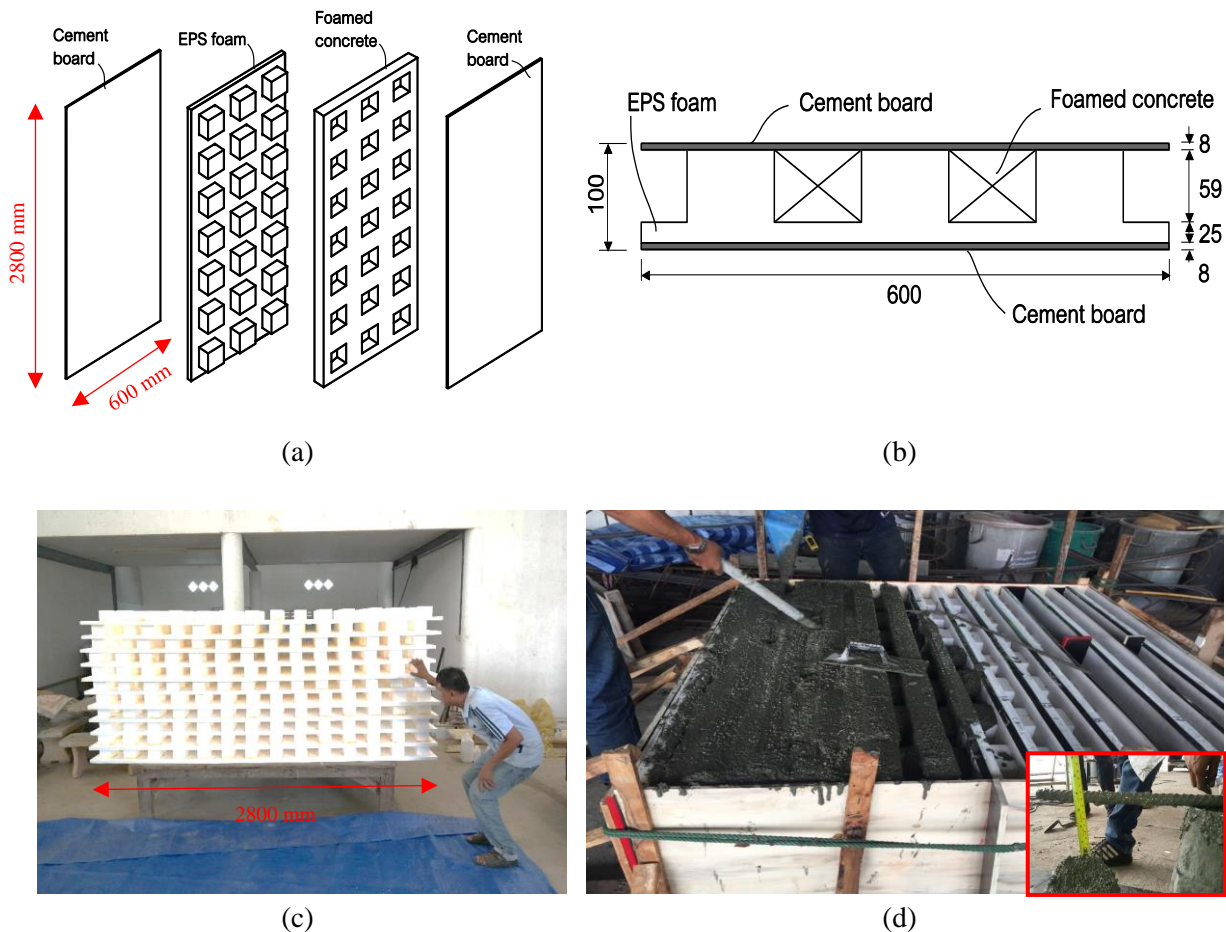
UWall SIP: (a) geometry and components, (b) cross section (in mm), (c) waffle EPS, and (d) laying of foamed concrete.
